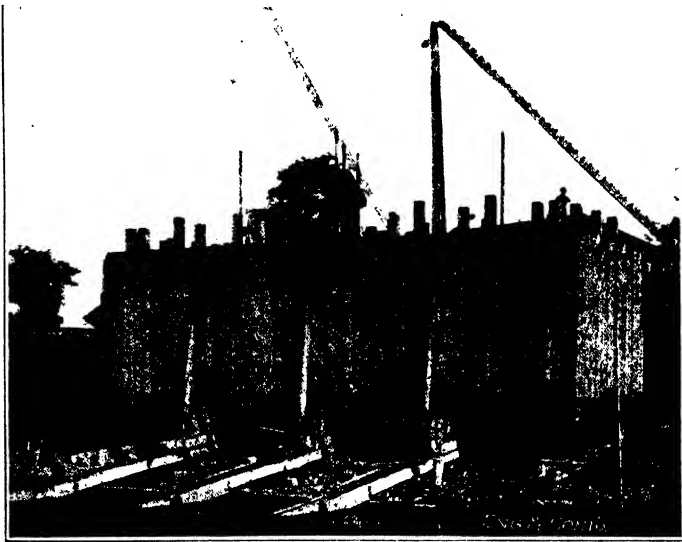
Caisson on Launching Ways. Vancouver Bridge.
